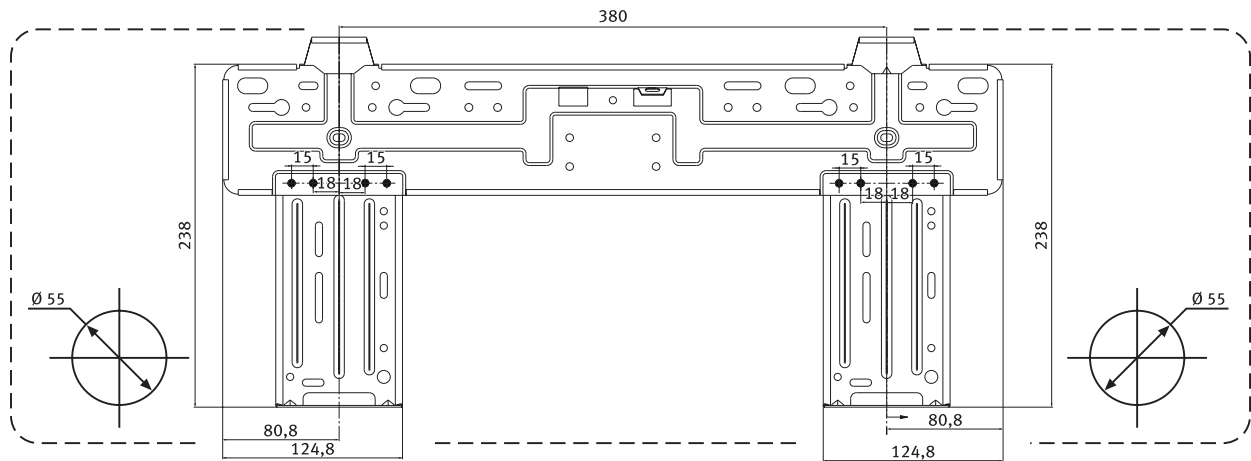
Mounting plate for 3-025 WNI and 3-035 WNI.
